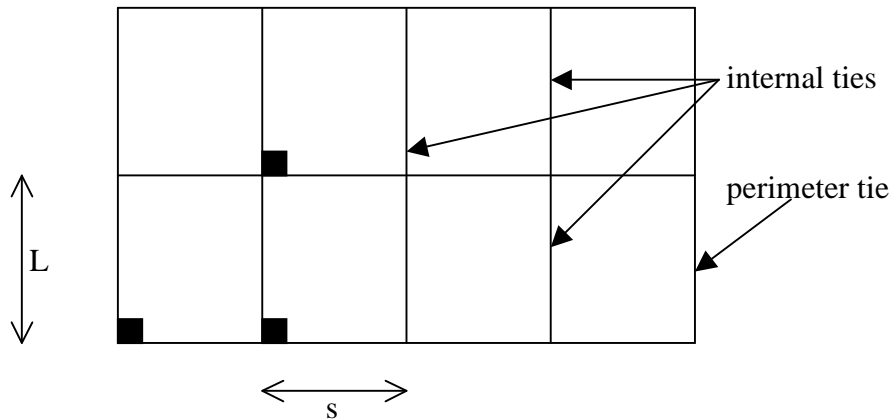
Example of effective horizontal tying of a framed office building.
